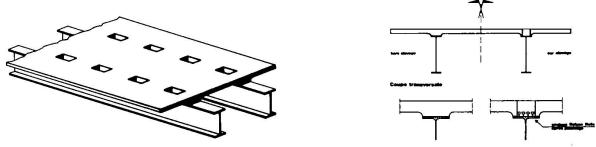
A precast concrete slab launched on the steel structure with pocket, to later weld Nelson studs.
